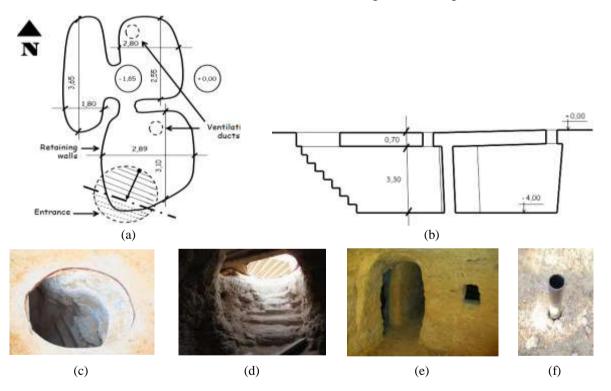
Underground building conditions: (a) Undergroun building plan, (b) Undergroun building section, (c) Entrance, (d) Staircase, (e) Indoor spaces, (f) Ventilation Ducts.
